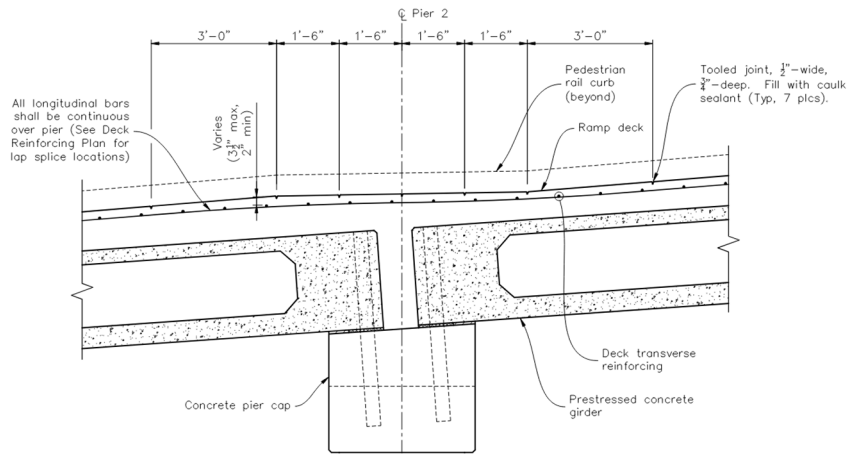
CRACK CONTROL DETAIL AT INTERMEDIATE PIERS
